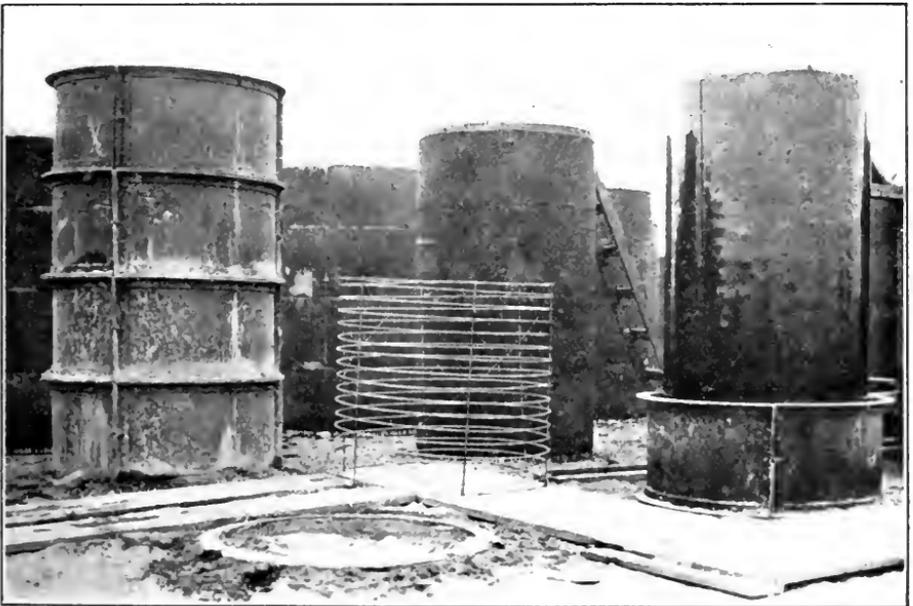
FIG. B.—Moulds for casting 47-in. reinforced concrete pipe. Umatilla Project, Ore.
